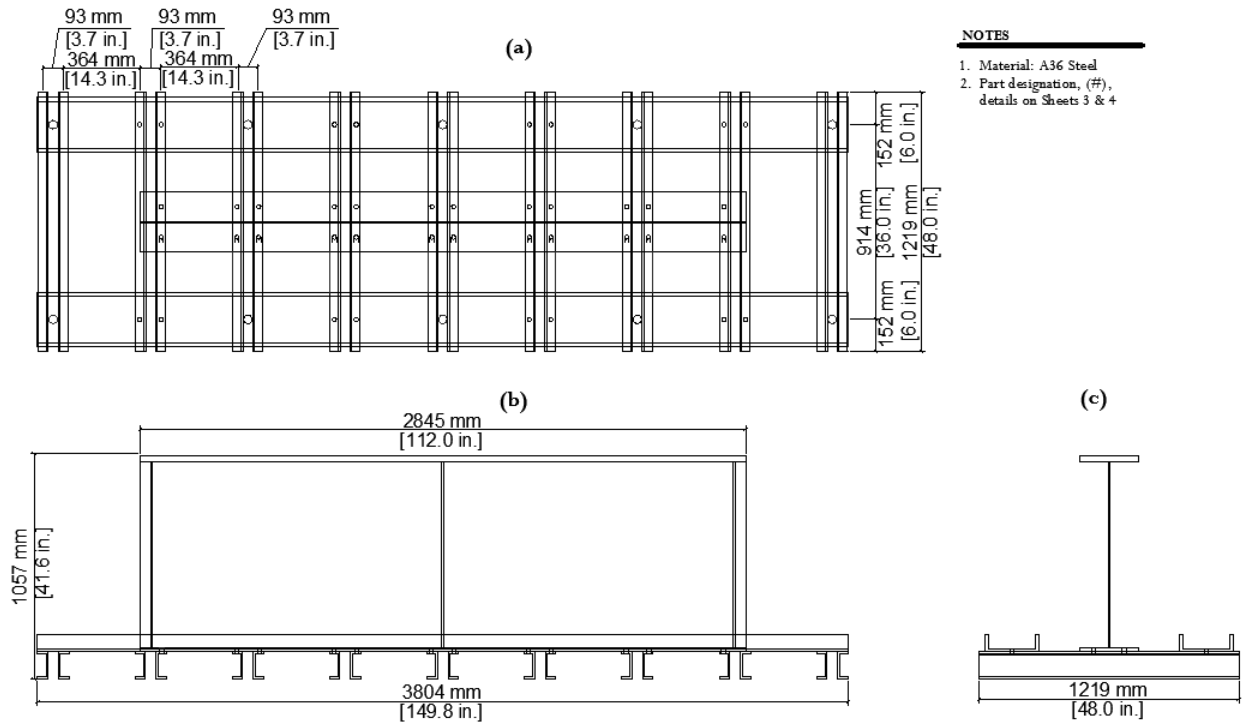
Girder Specimen: a) Plan view b) Elevation view c) Section view
